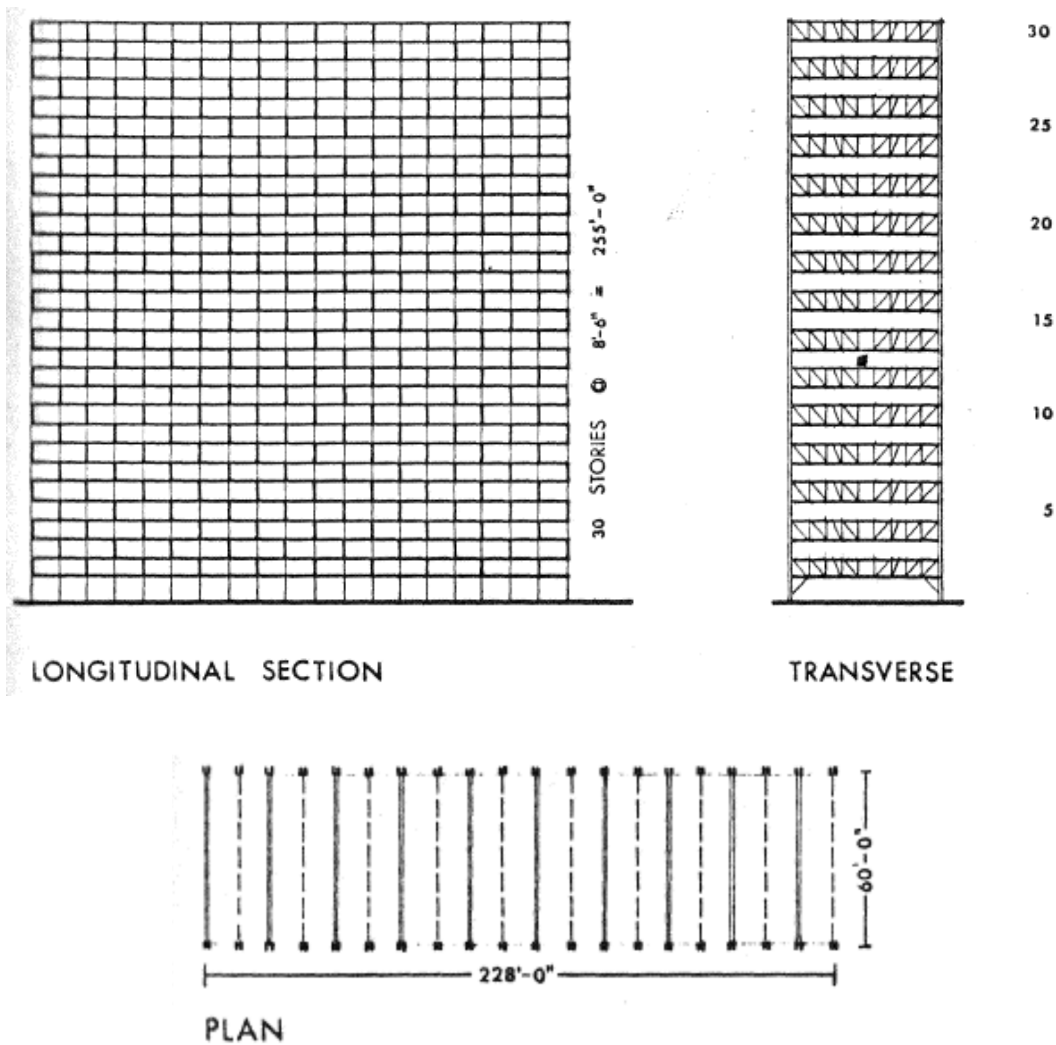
The structural geometry the proposed STF system by the MIT team, 1967
